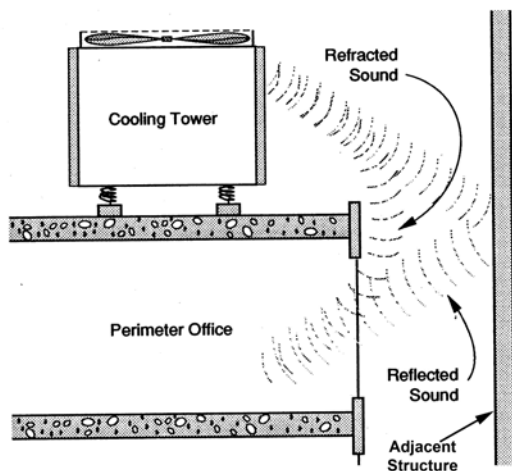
Reflected and refracted equipment sound at a building perimeter. Do not locate noisy equipment near a roof perimeter where this can happen.
